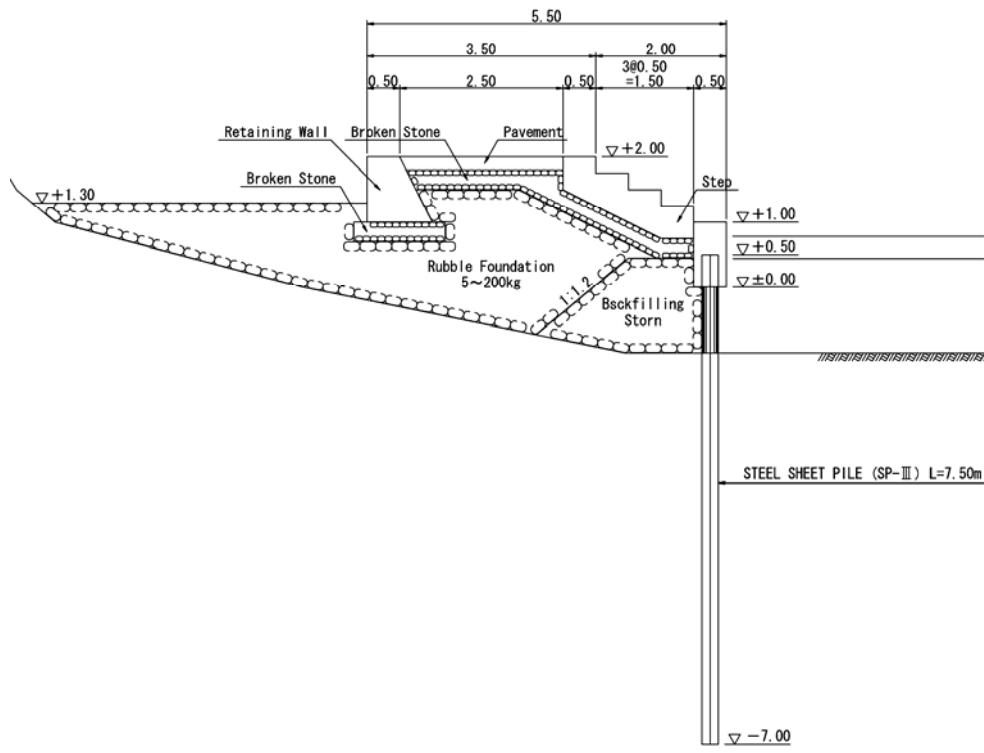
Typical Cross Section of Revetment Wall
